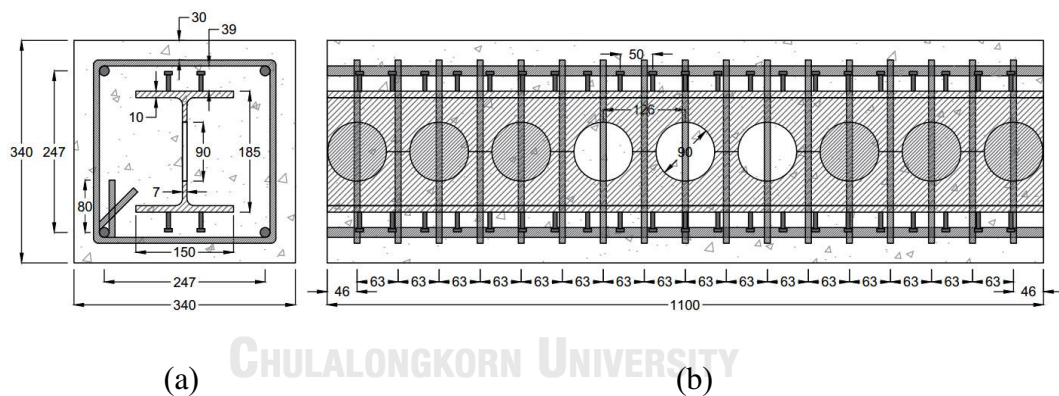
Typical reinforcement details of CECS column (column C1s-63);
